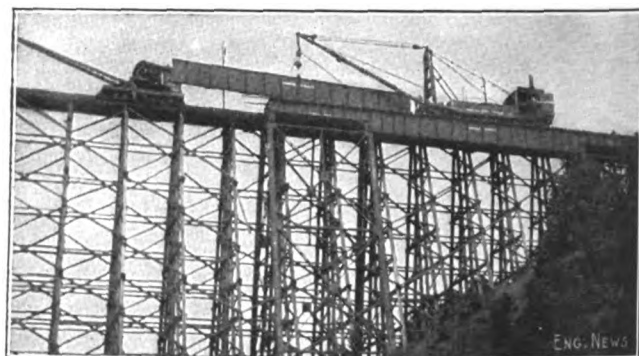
PLACING AN 80-FT. GIRDER ON THE BOONE VIADUCT FOR THE FT. DODGE, DES MOINES & SOUTHERN RY.
